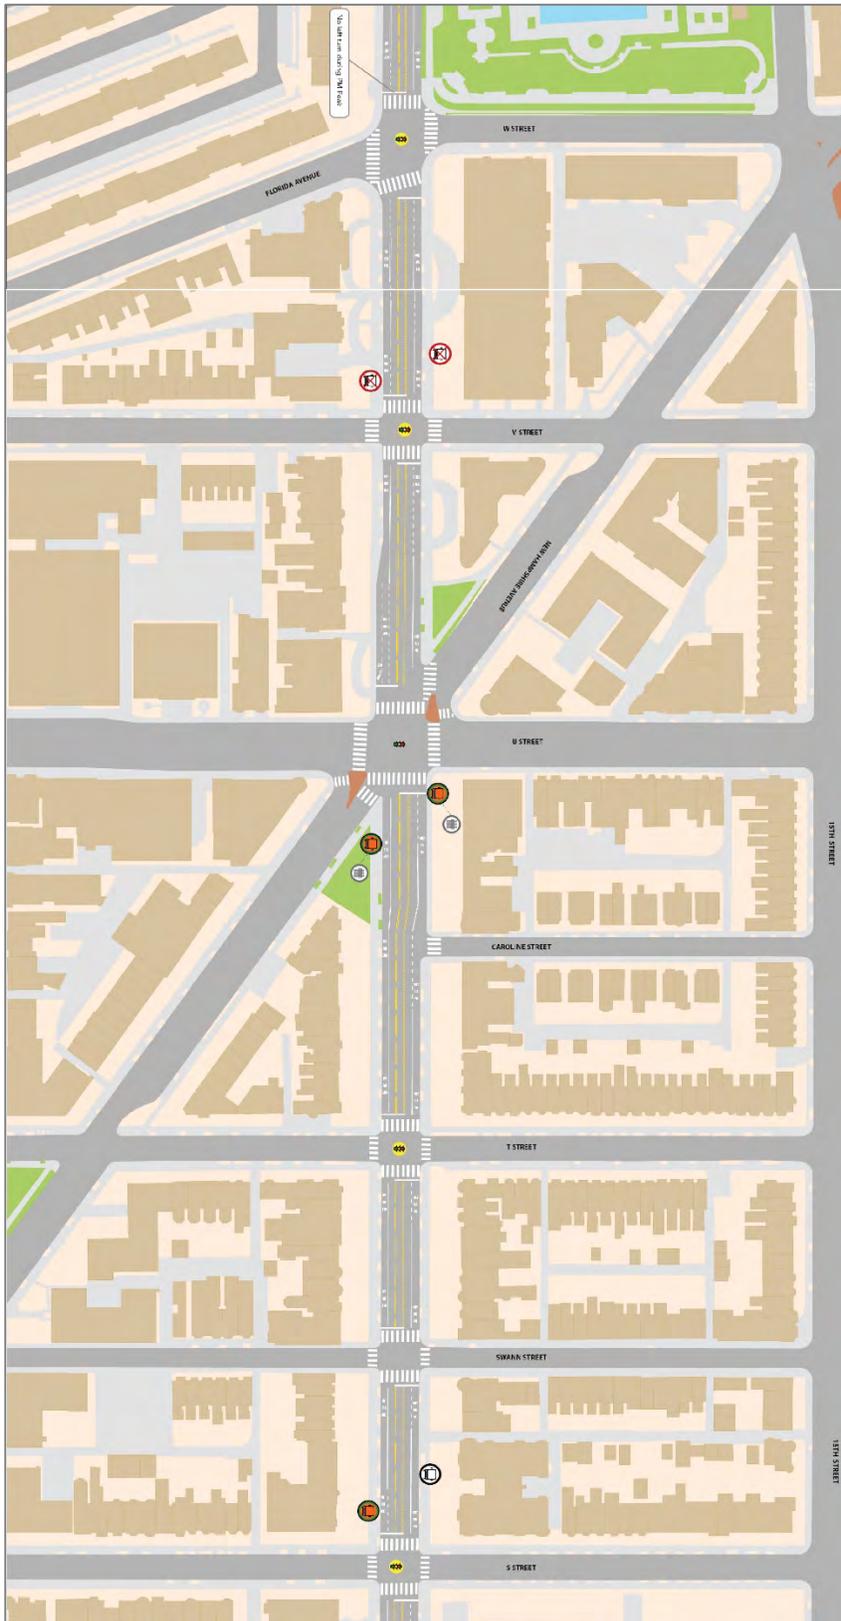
Recommended Improvements – S Street NW to P Street NW
